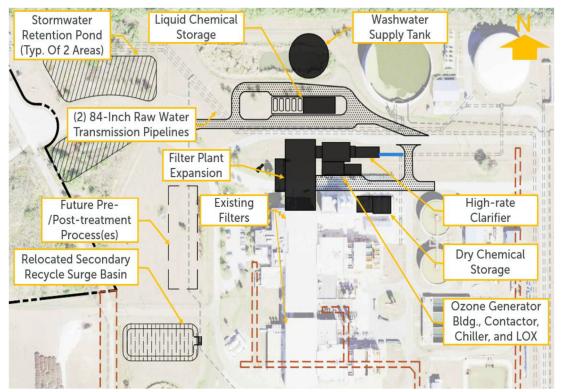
North Partial Site Plan (Source: Regional Surface Water Treatment Expansion Feasibility Study, Hazen, September 2021)
